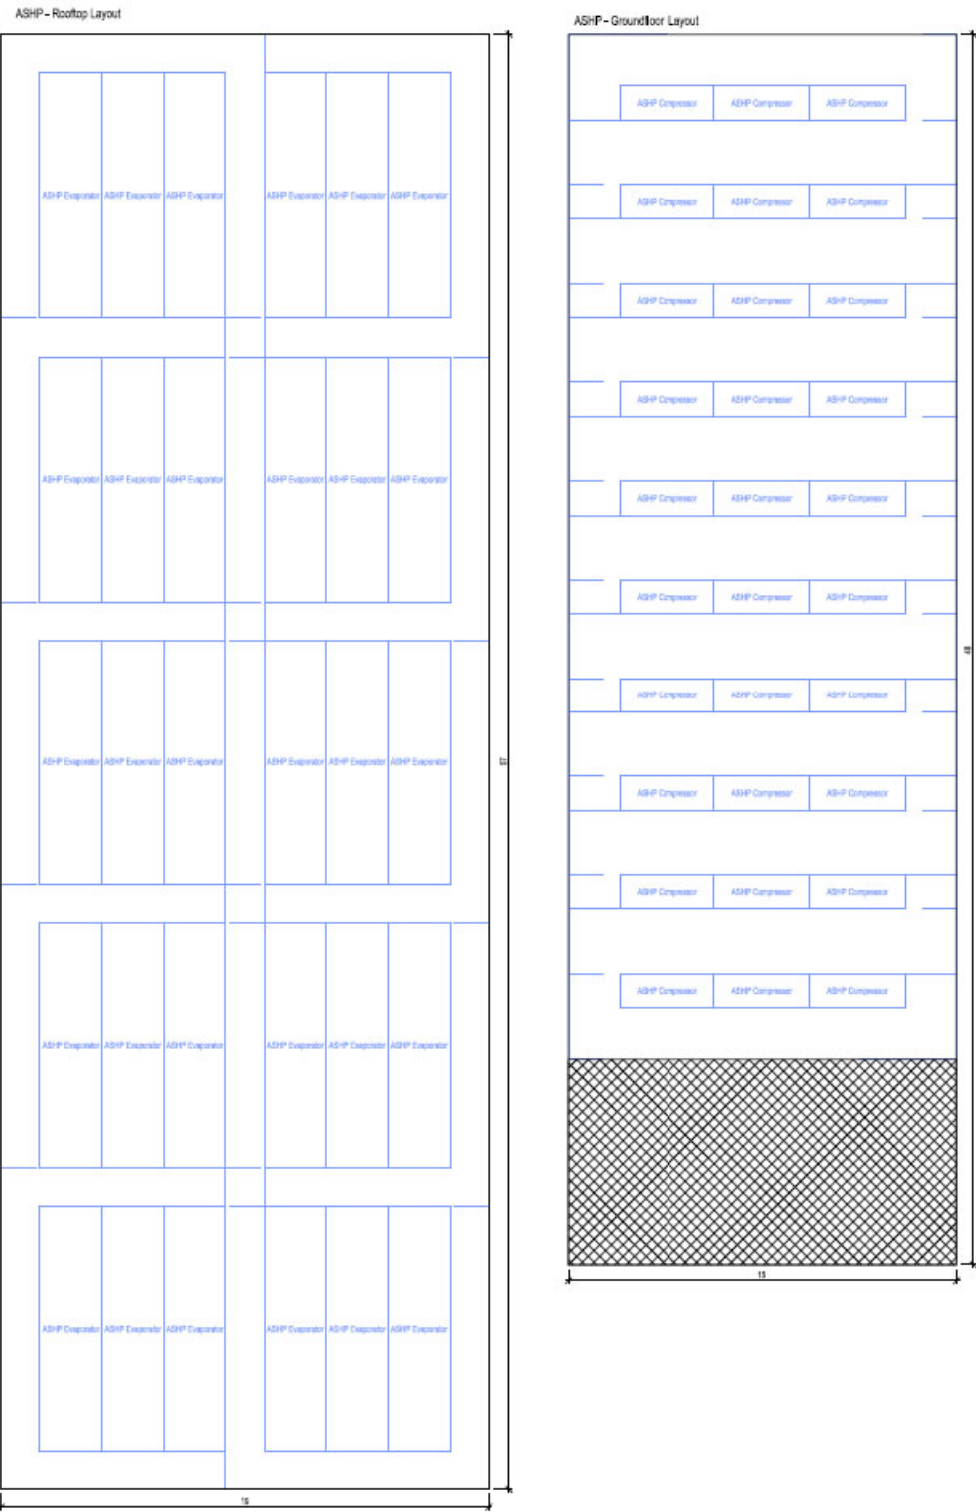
10 MW ASHP scheme rooftop and groundfloor footprint
